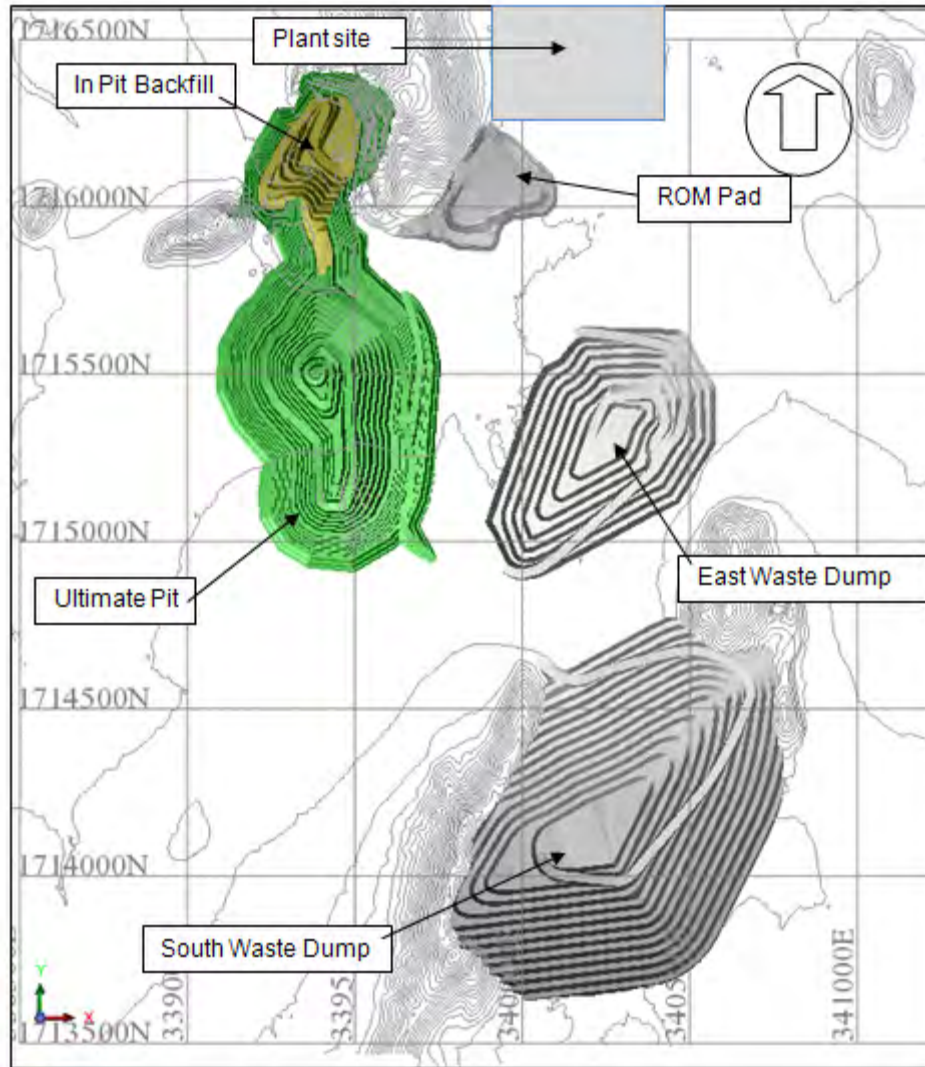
Location Plan, Bisha Pit and Waste Dumps
